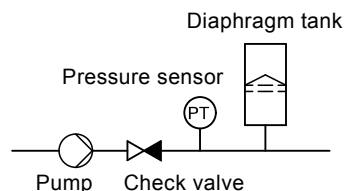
Position of the non-return valve and pressure sensor in system with positive inlet pressure
